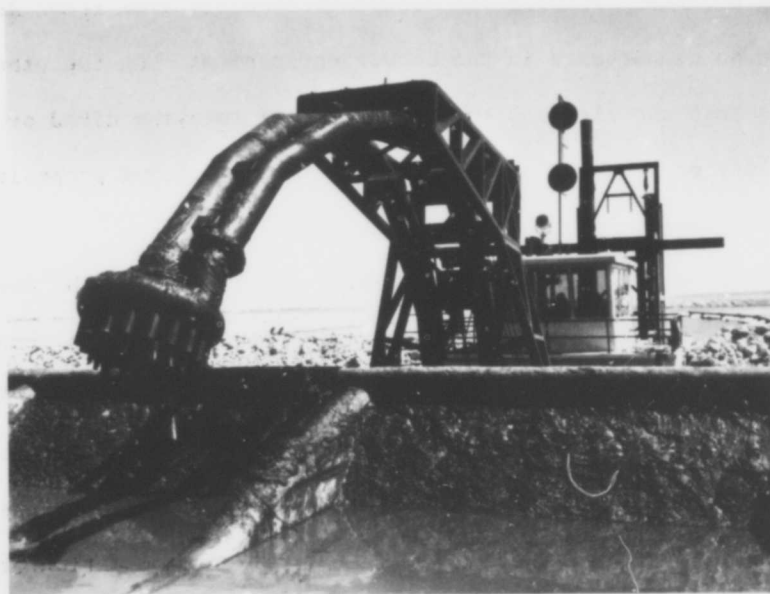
Suction Pipe on Redesigned Hydraulic Dredge
